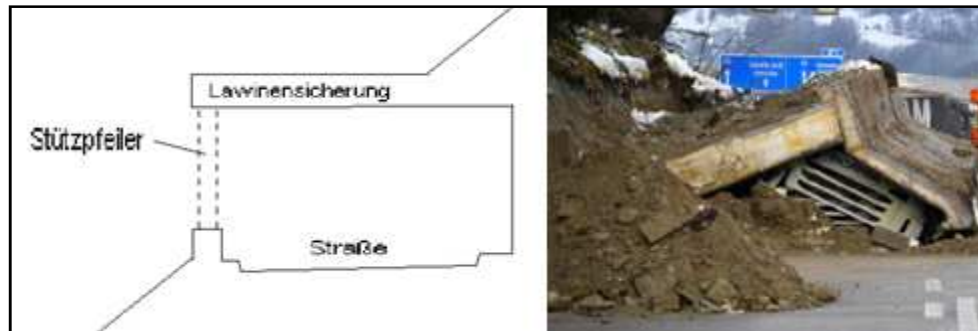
(Avalanche) galleries protect roads and traffic against avalanches, landslides or falling rocks. They are often located in complex terrain and should be of robust construction as they have to withstand excessive forces.
